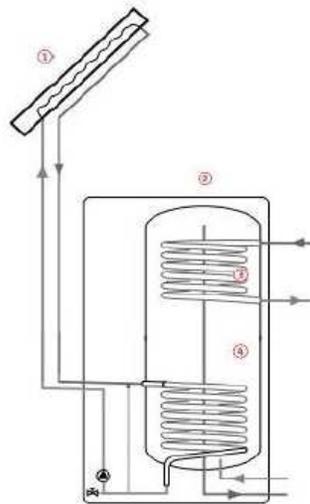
Section drawing of a boiler (1. Sun collector, 2. Drain back container, 3. Built-in after heating spiral, 4. Boiler 300 l)
